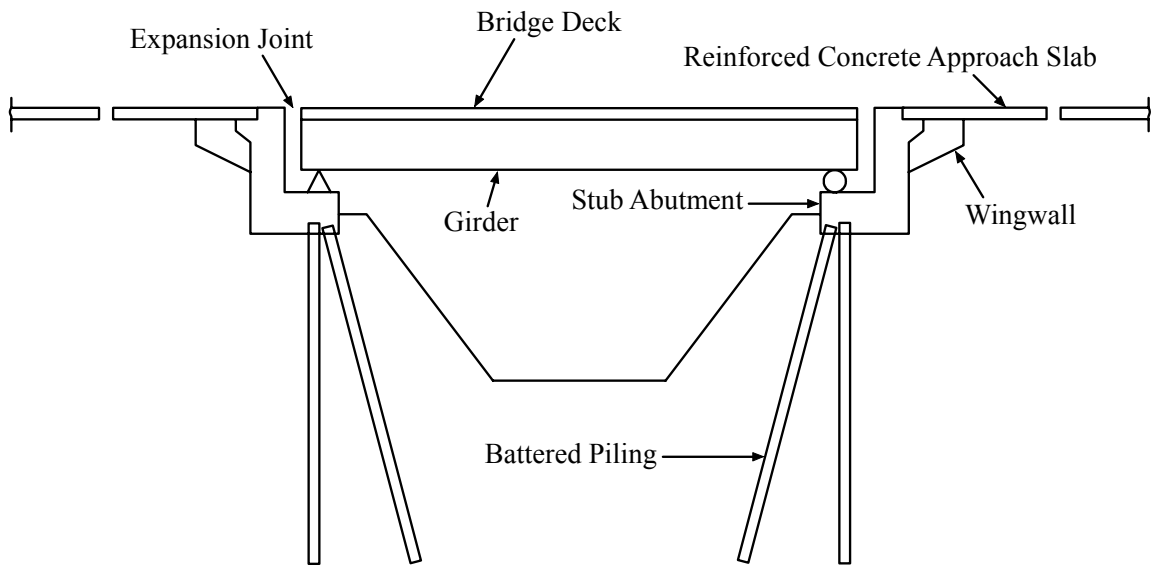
A simplified cross section of a non-integral abutment bridge (Greimann et al. 1987)
